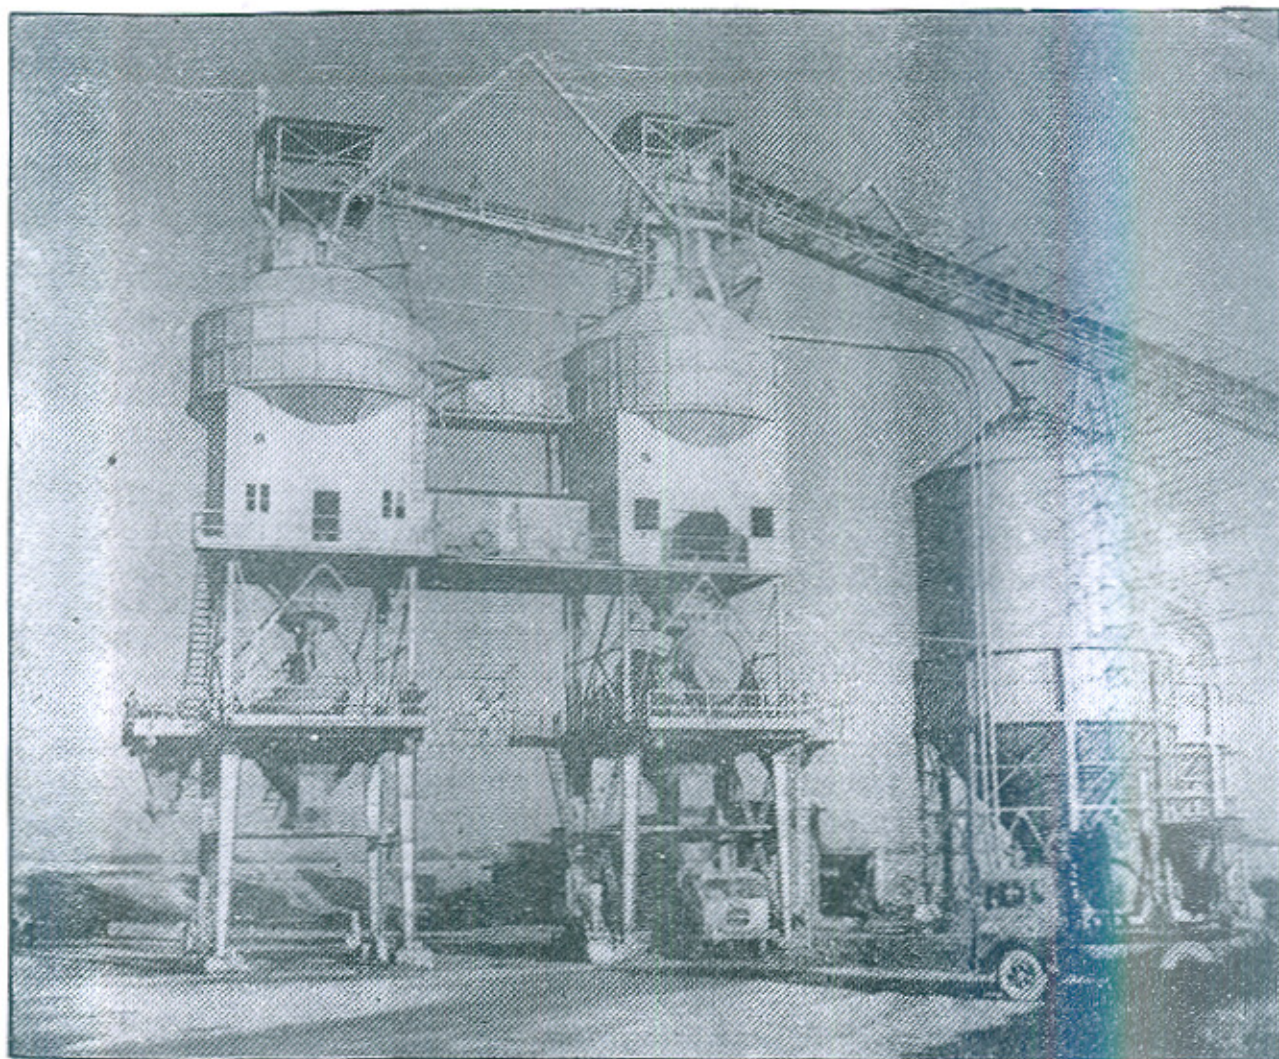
Main concrete batching and mixing plant with cement silos in the background
